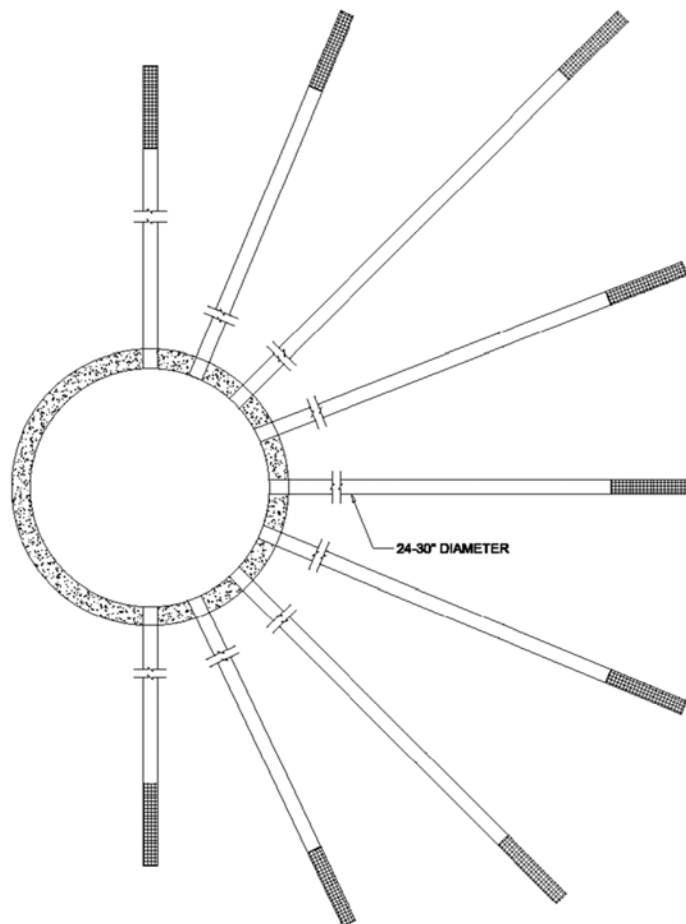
Plan View of a Typical Radial Collector Well System (FPL 2014-TN4058)
